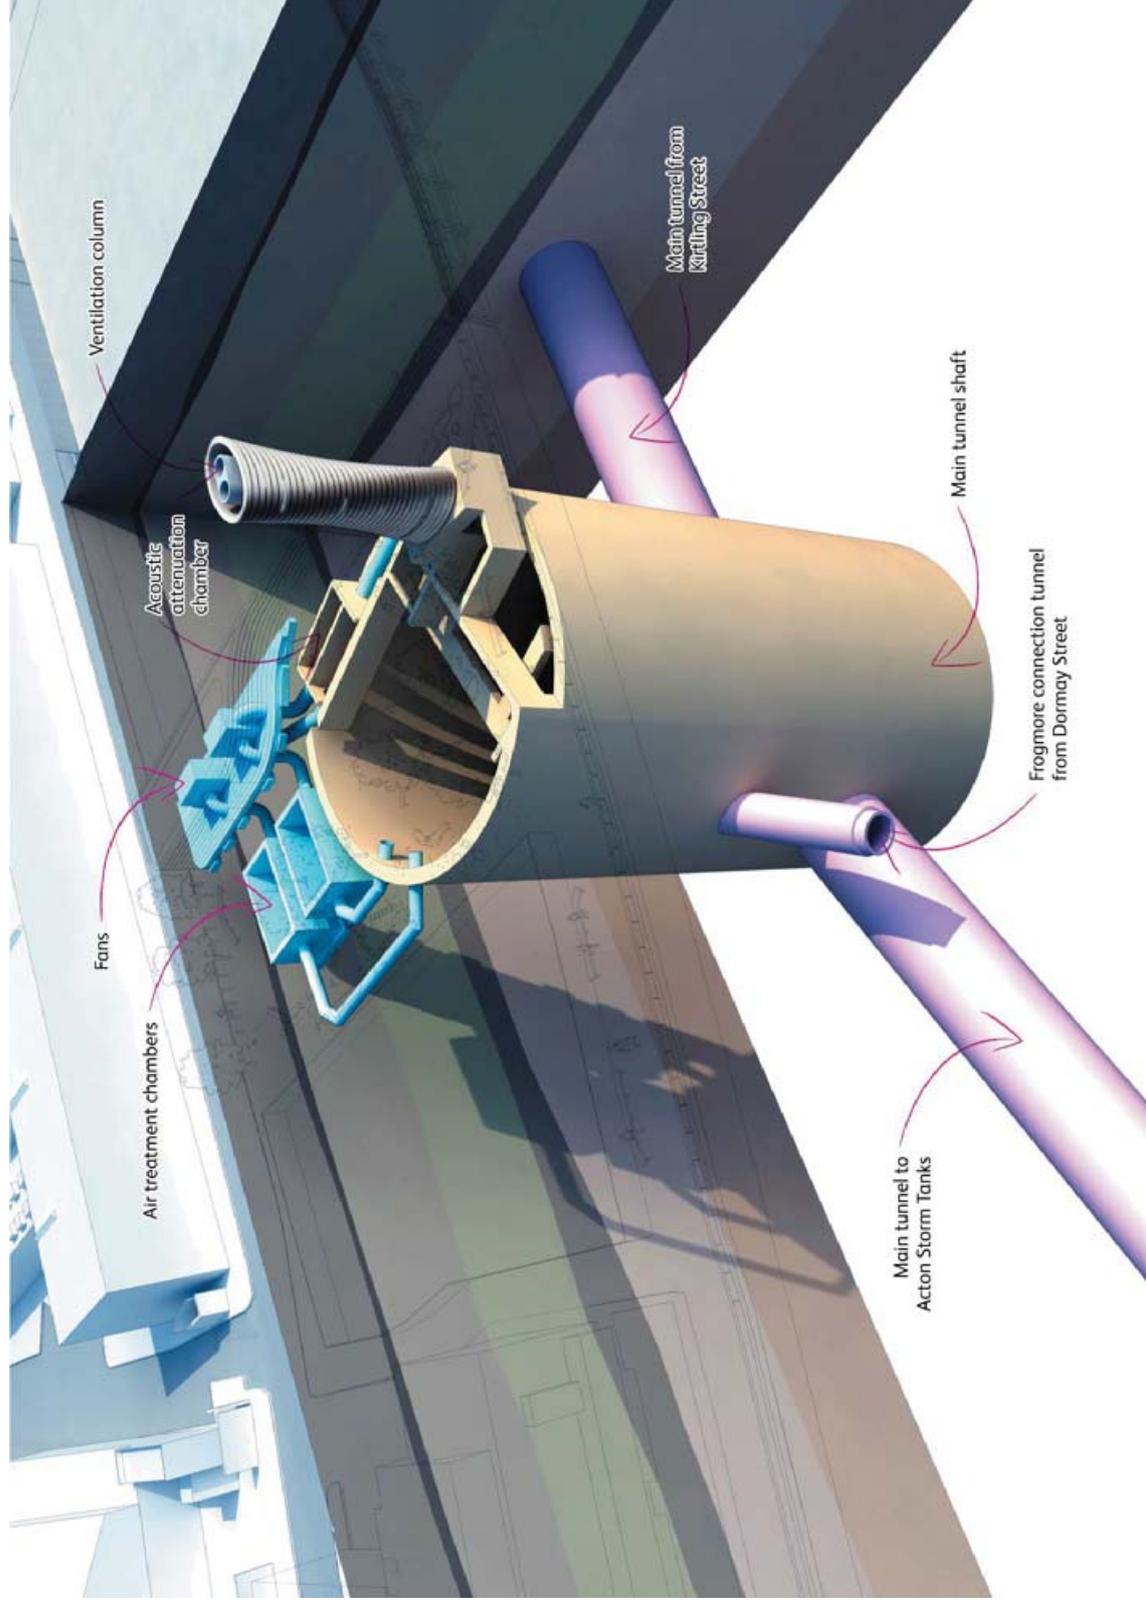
Carnwath Road Riverside site – illustrative aerial view
